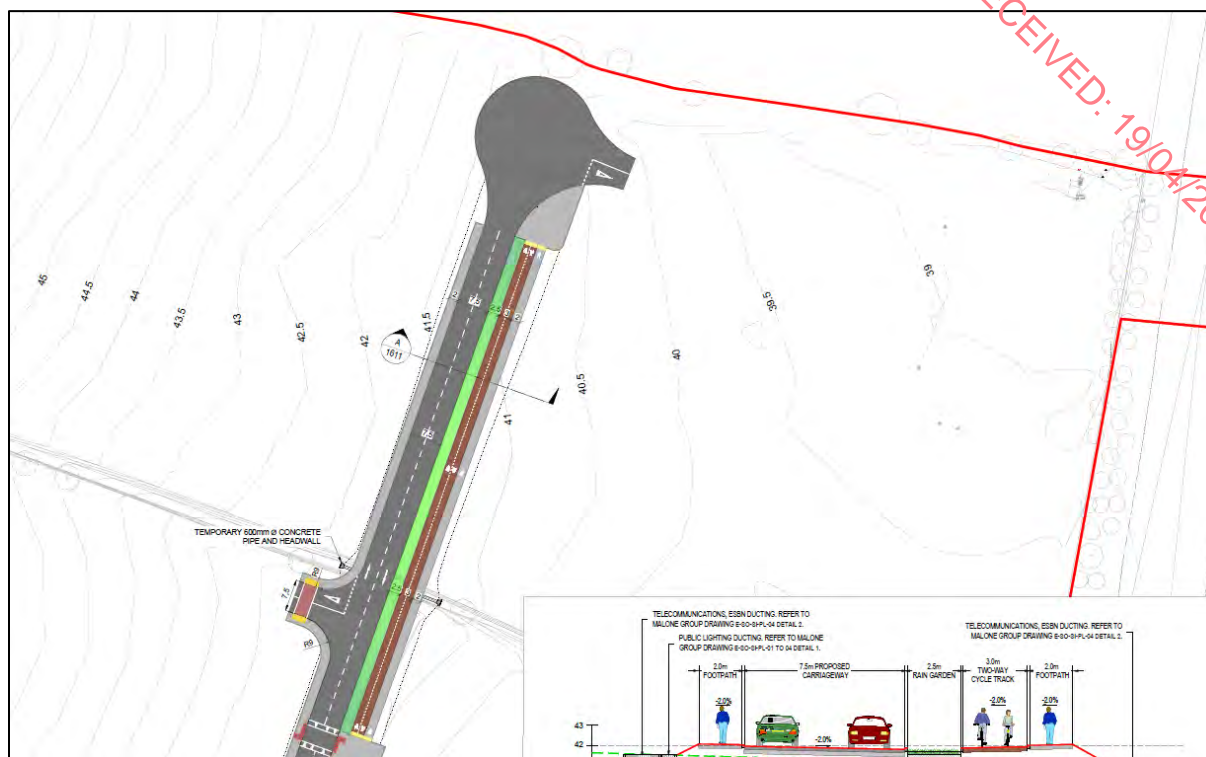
; Example Cross section of proposed internal access route within Zone A
